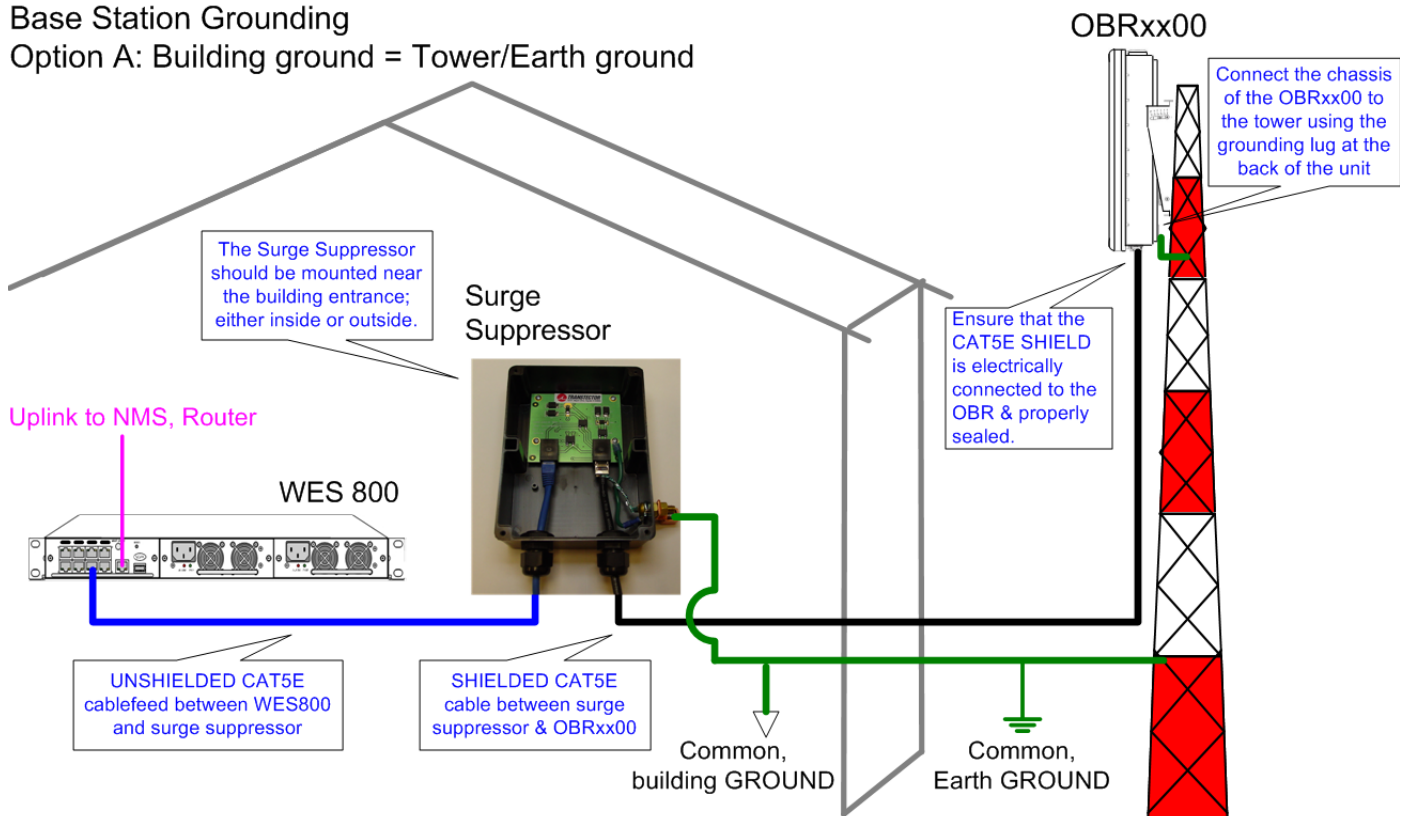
Base Station Grounding - building ground is same as tower ground
